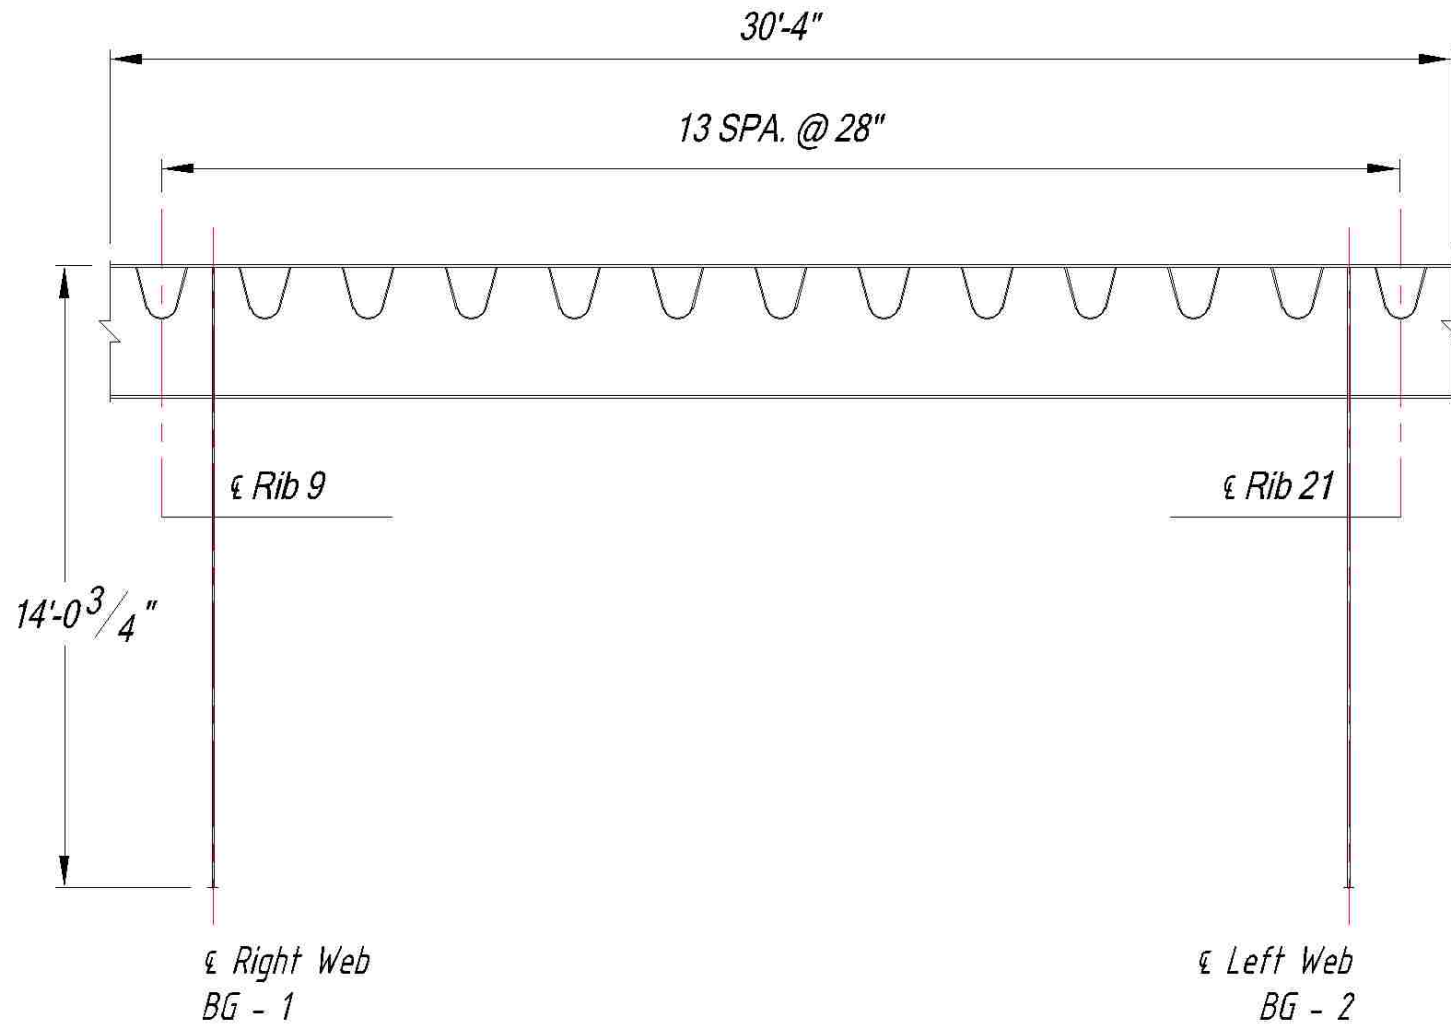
Cross section of Submodel B with connection Type 1B looking east
